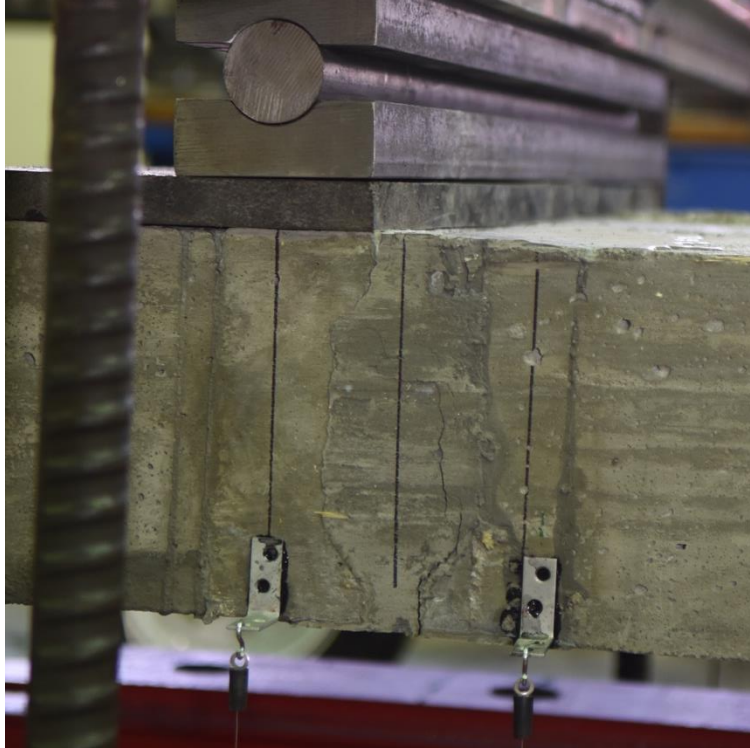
Initial Cracking at the Grout (Specimen F-F-2)
